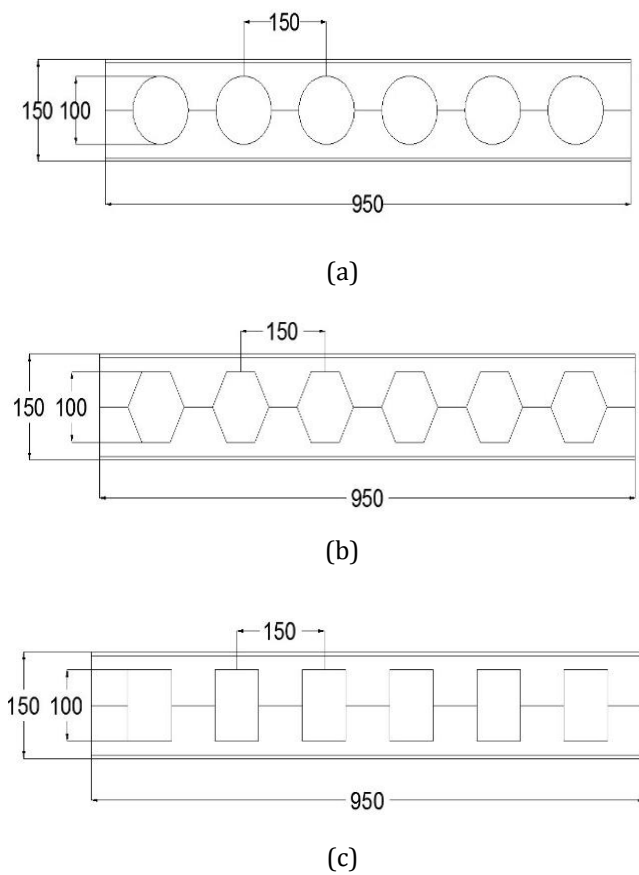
Dimensions of beams (a) Cellular (b) Hexagonal (c) Rectangular
